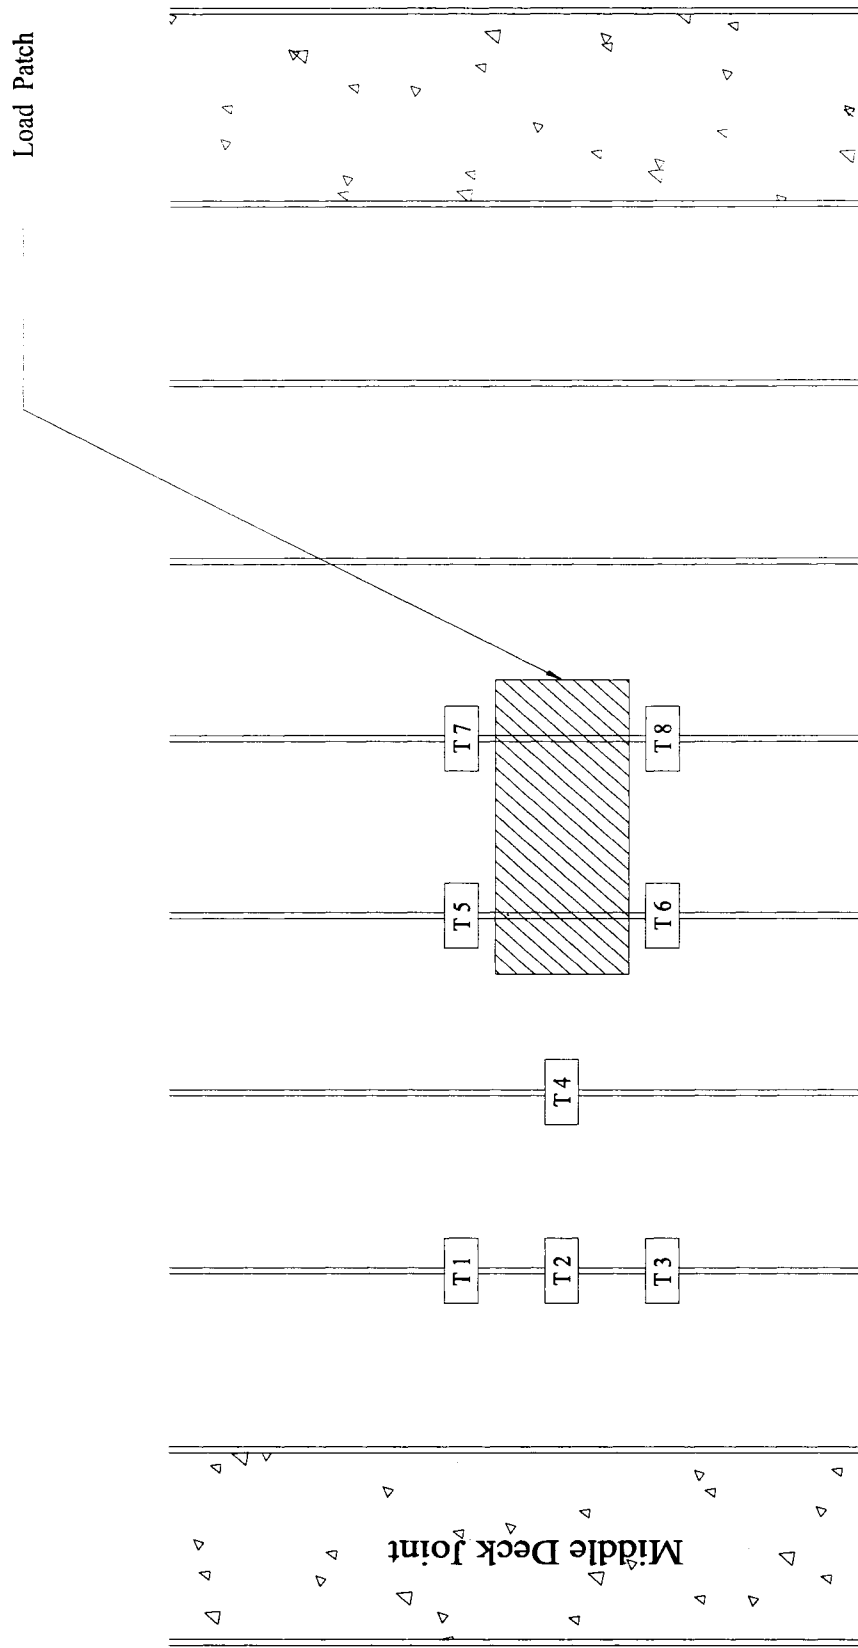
Fatigue Test 2 Gage Layout, Top of Side A
